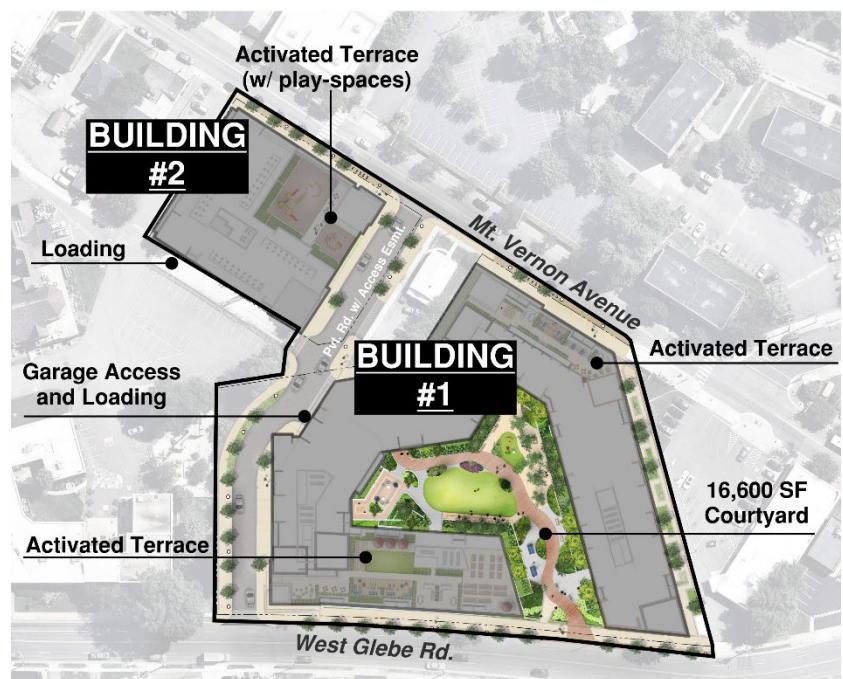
Rendered site plan of AHDC Glebe/Mt. Vernon
